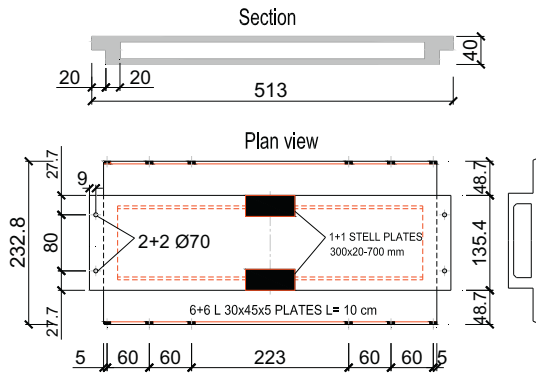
Cross section and dimensions of the box-type slab elements used in the diaphragms of the first and third floor (dimensions in cm).
